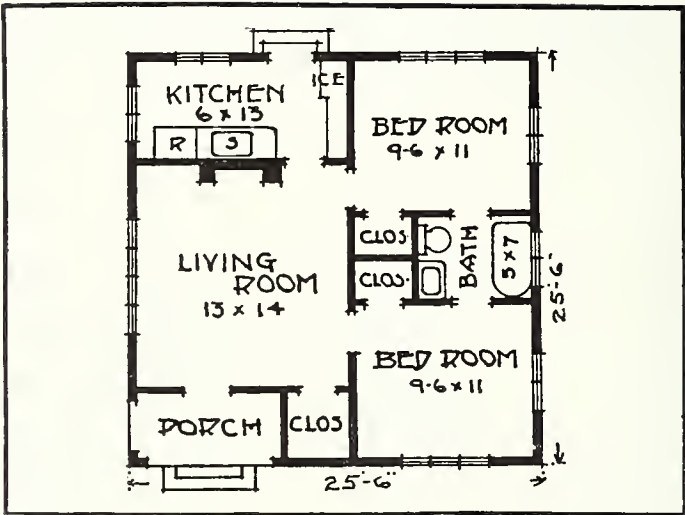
and 5. One-story cottage of concrete, Milton Dana Morrill, *Architect*. A group of these small houses would make a striking and attractive colony, with concrete walls finished in white cement, and with a garden around each house.
